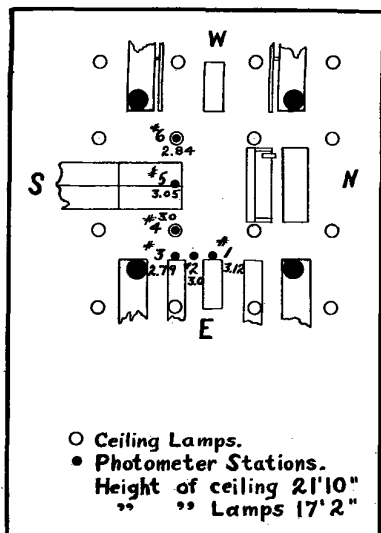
Section plan of basement in well, (notion department), showing location of furniture, pillars, lighting units, test stations and illumination data.
